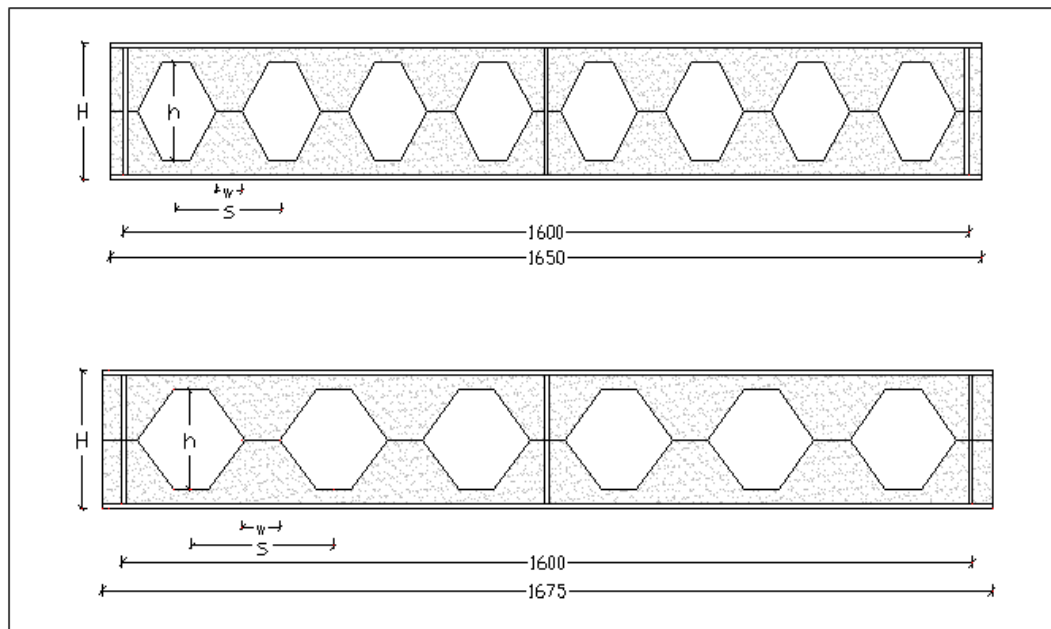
Dimensions and notation of castellated steel beams specimens.
